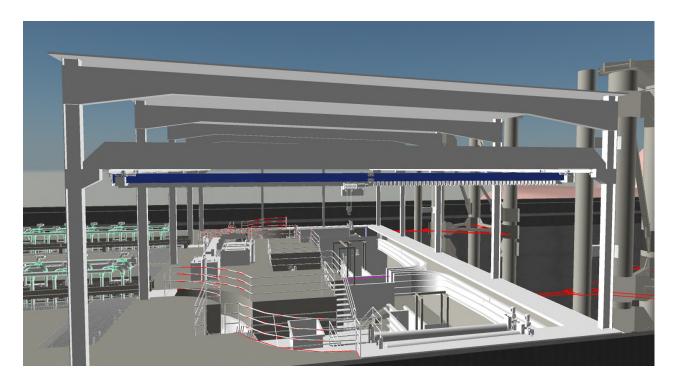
Fish Handling Facility Building Bridge Crane
